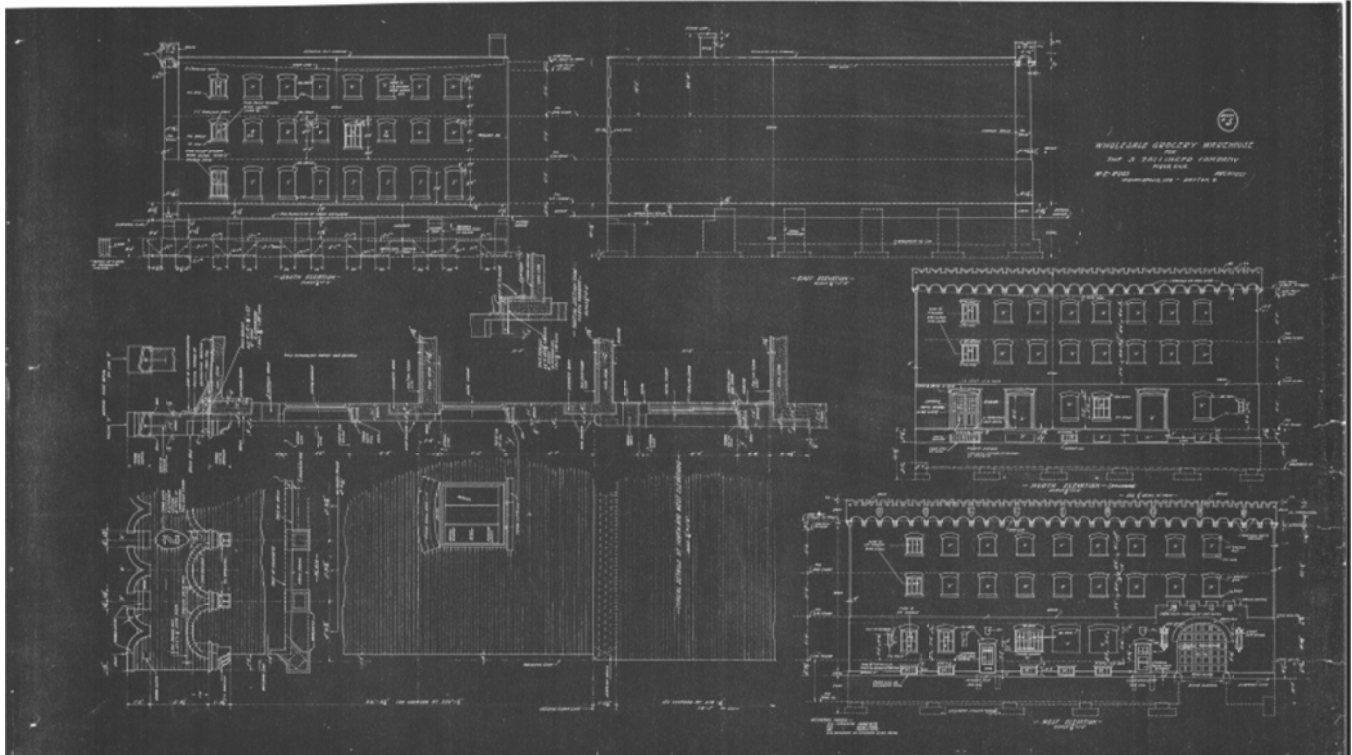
Elevations and Wall Sections/Details of the Zollinger Building, prepared by William Earl Russ, Architect, in 1914.
